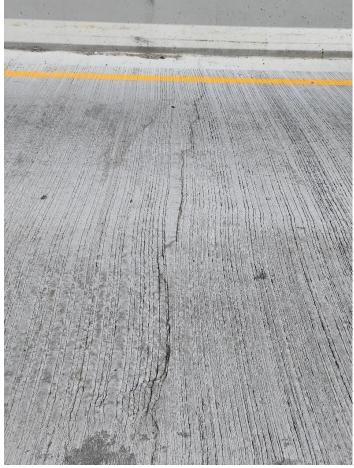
Overlay cracking observed on Bridge B40-336 eight months after placement.
